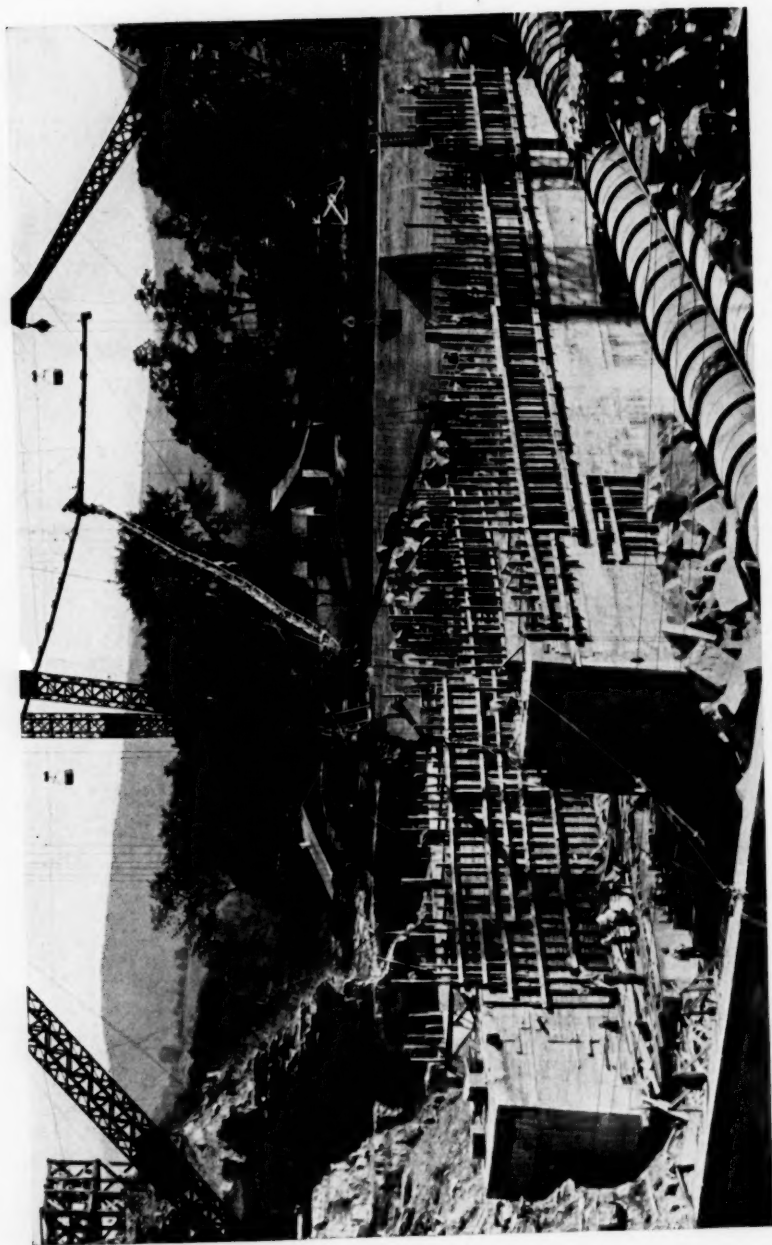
GILBOA DAM UNDER CONSTRUCTION
